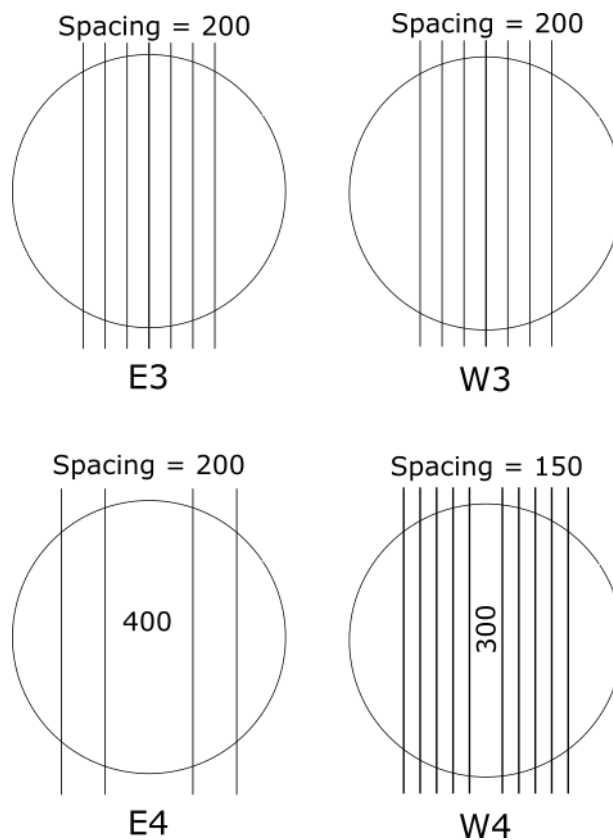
Layout of steel cables. Spacing is in millimeters, all sets are centered with the frame. The circle is the test frame, with a nominal diameter of 2500 mm.
